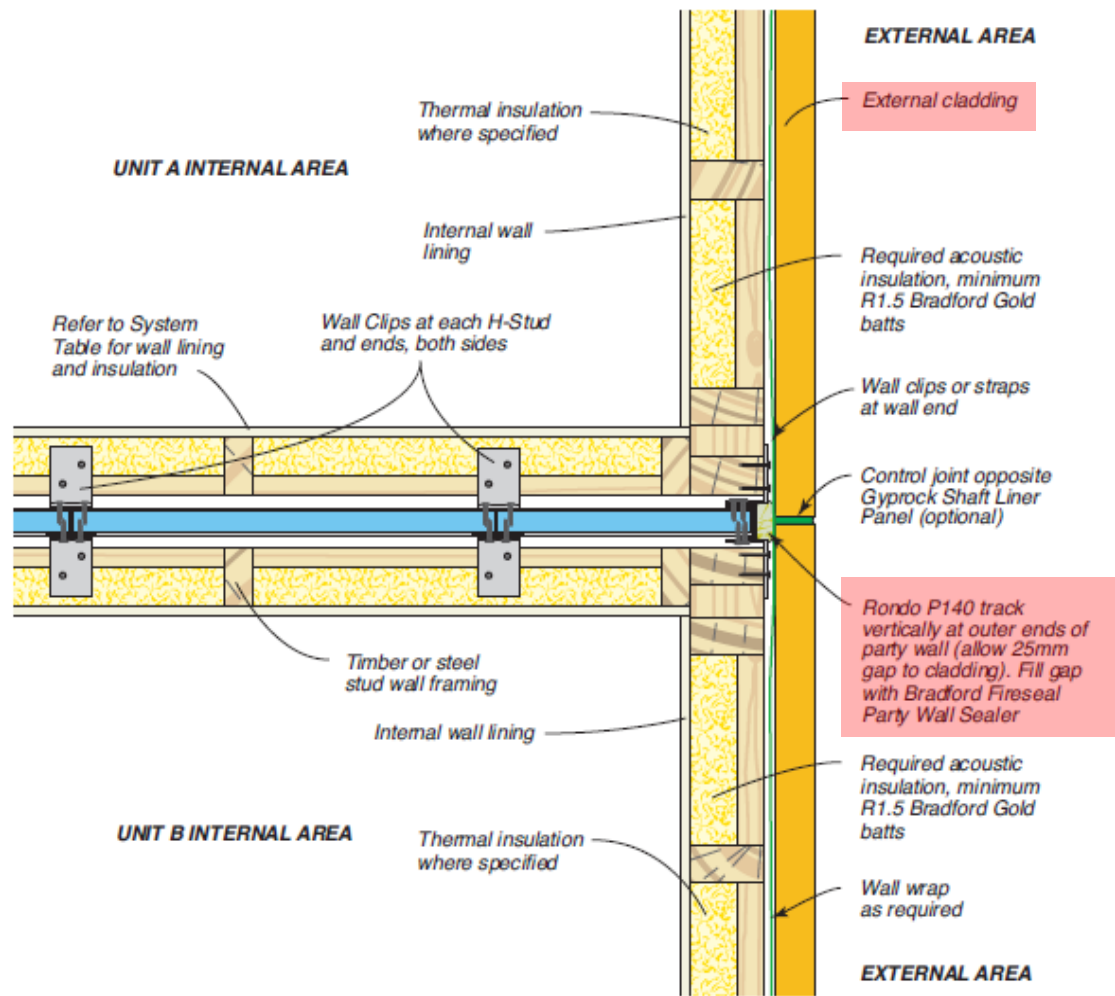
Junction Of Party Wall And External Wall With Lightweight Cladding Direct Fixed to Studs – Plan View
